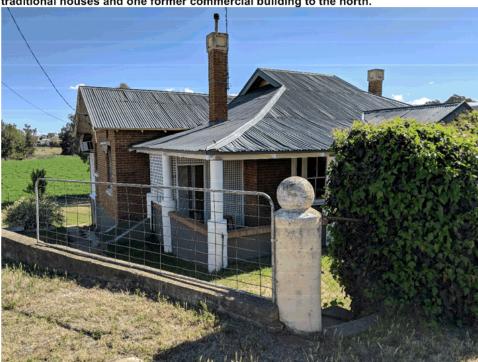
The adjoining property to the NW boundary. Brick and iron traditional dwelling set low on the site. No existing boundary planting to the adjoining boundary. Screen hedge planting along the front boundary.
